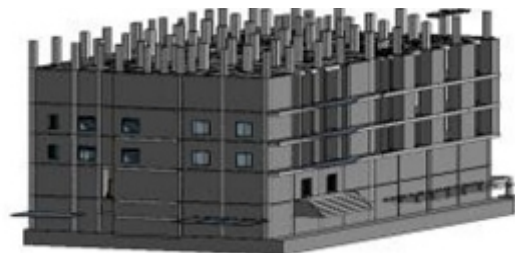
5th floor level and slab, 2nd FL wall and floor
